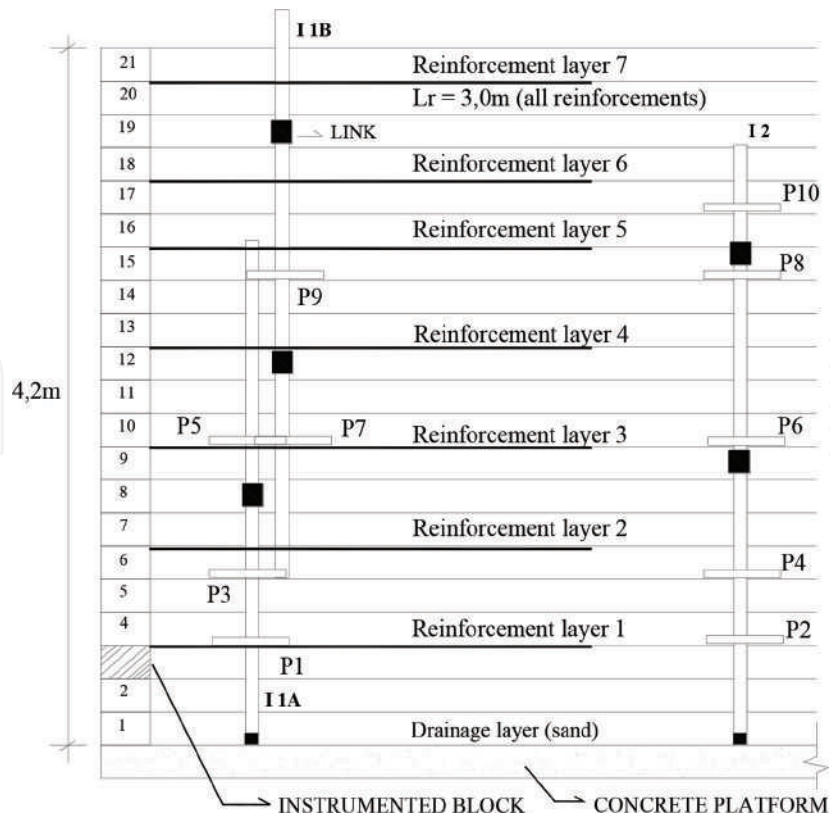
Cross section of instrumented wall: P is settlement plate and I is inclinometer, [6].
